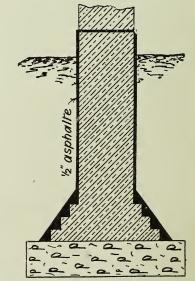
Asphalt Damp-proofing, Horizontal and Vertical.
